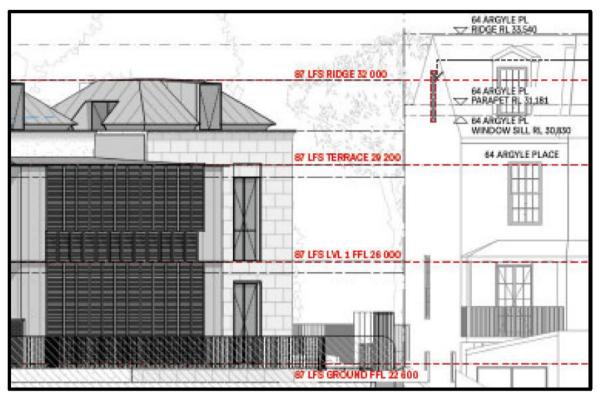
Outlook from 64 Argyle Place - Attic Window and ground floor window (Source: Andrew Burns Architecture)
